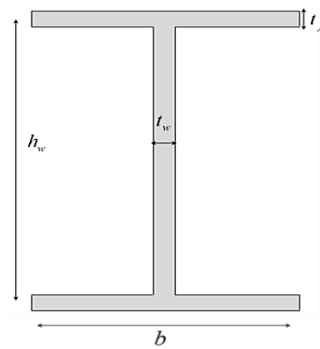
Typical bi-symmetric steel I-shaped cross-section
